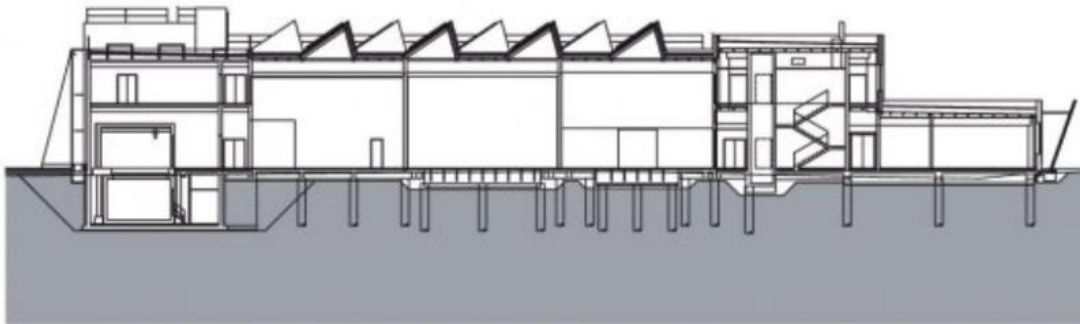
UCEEB DEMO BUILDING CROSS-SECTION
